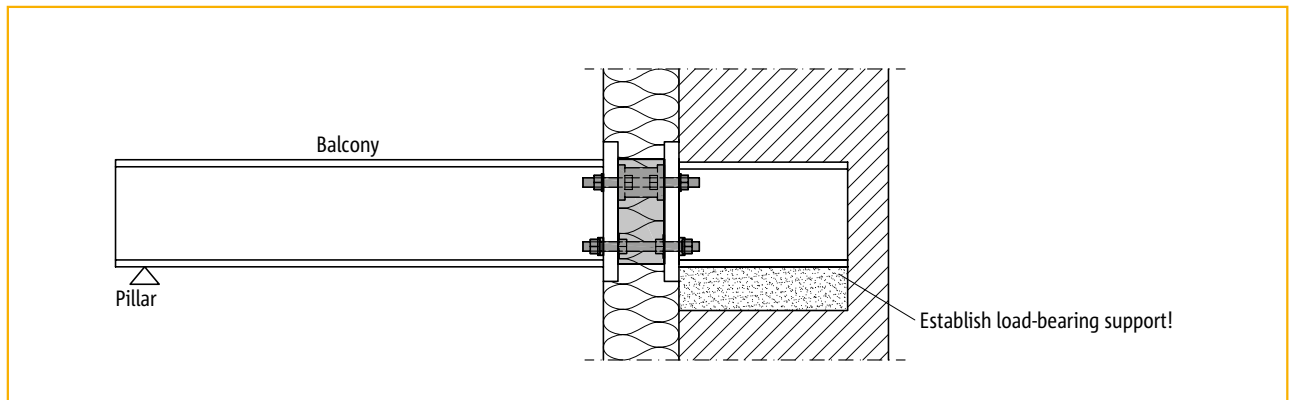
Balcony supported, connected with KSTZ and KSTQ modules (Steel balcony)
